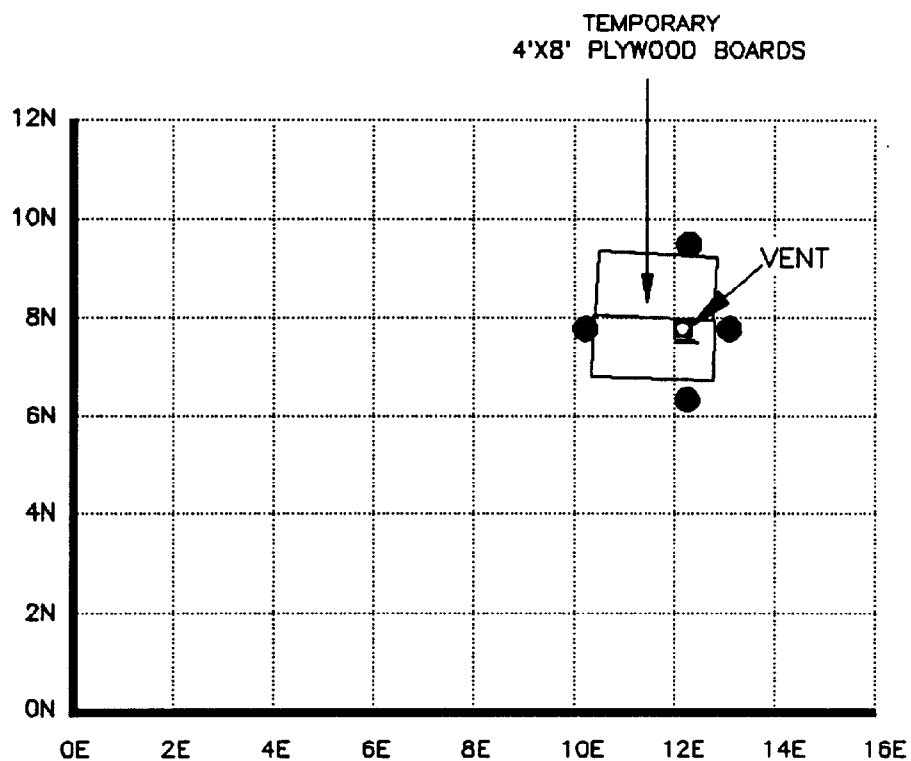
Building 23 Roof — Location of Vent Above Upper Storage Area
